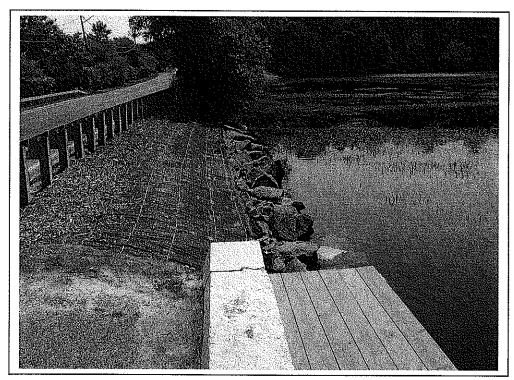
Spillway from Yaphank Lower Lake. Note; Deck structure and Aquatic plants.
